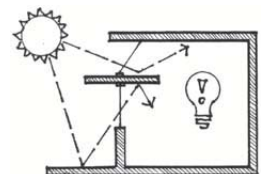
Building 241 interior provides great daylighting and sun control opportunities with high ceilings and north and south windows.
